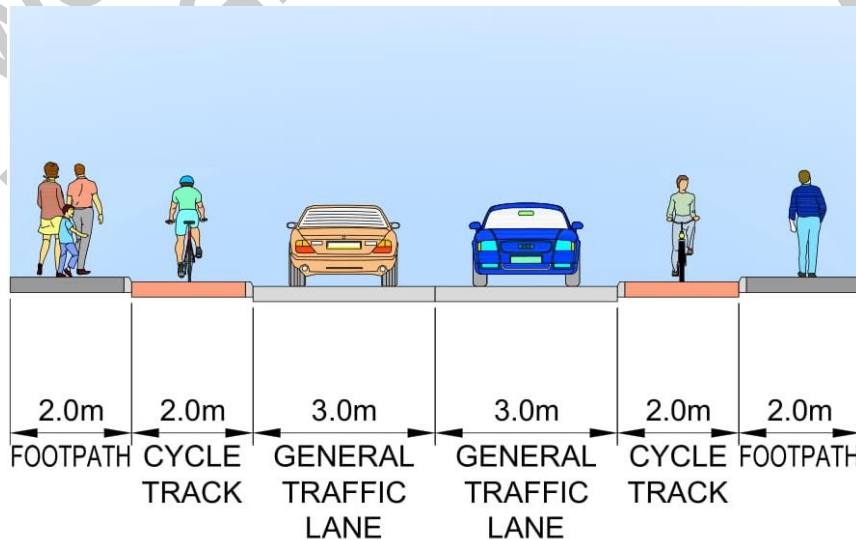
Section 2, Proposed Option 3 – Cross Section B-B
